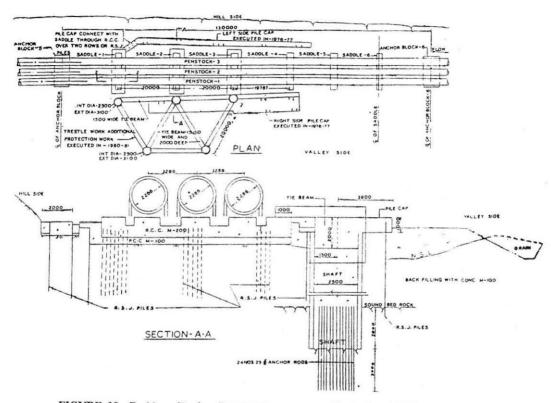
Problems During Construction of Anchor Blocks 5 and 6, Plan and Section (Loktak H.E. Project)
